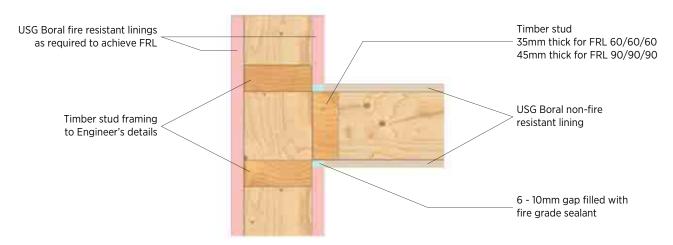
Single Timber Stud Fire Rated Wall to Non Fire Rated Wall T Junction Detail
